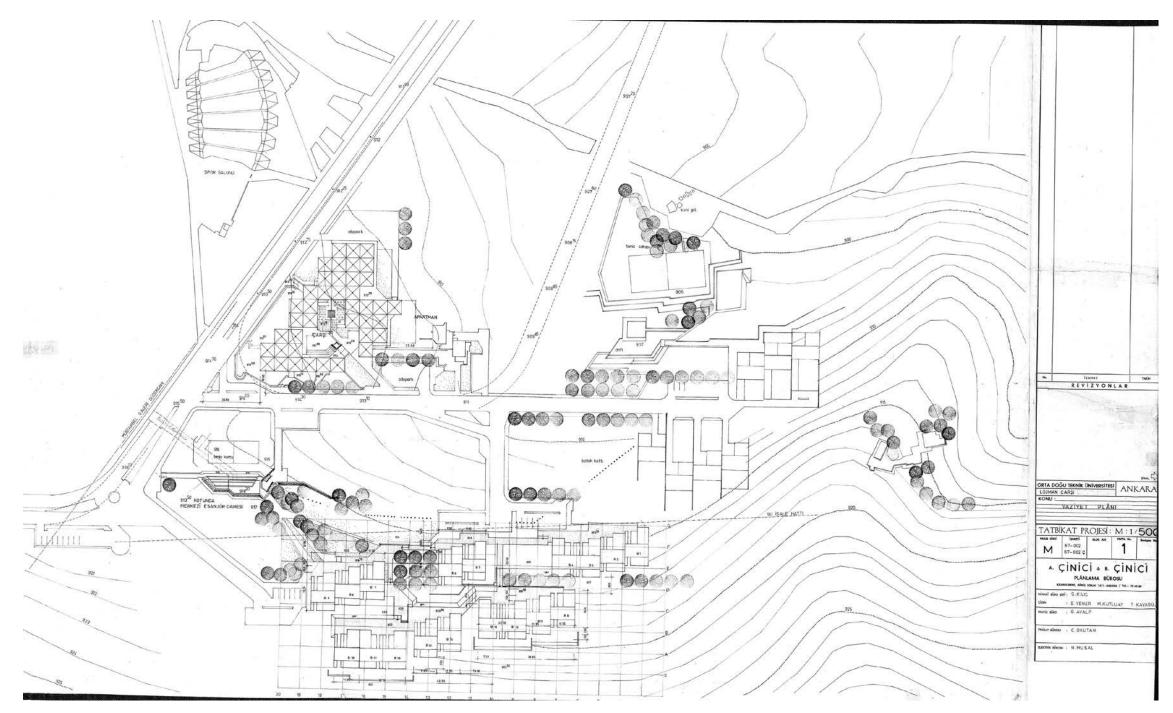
Original Drawing; Site Plan of *Çarşı* Source: METU Directorate of Construction & Technical Works
